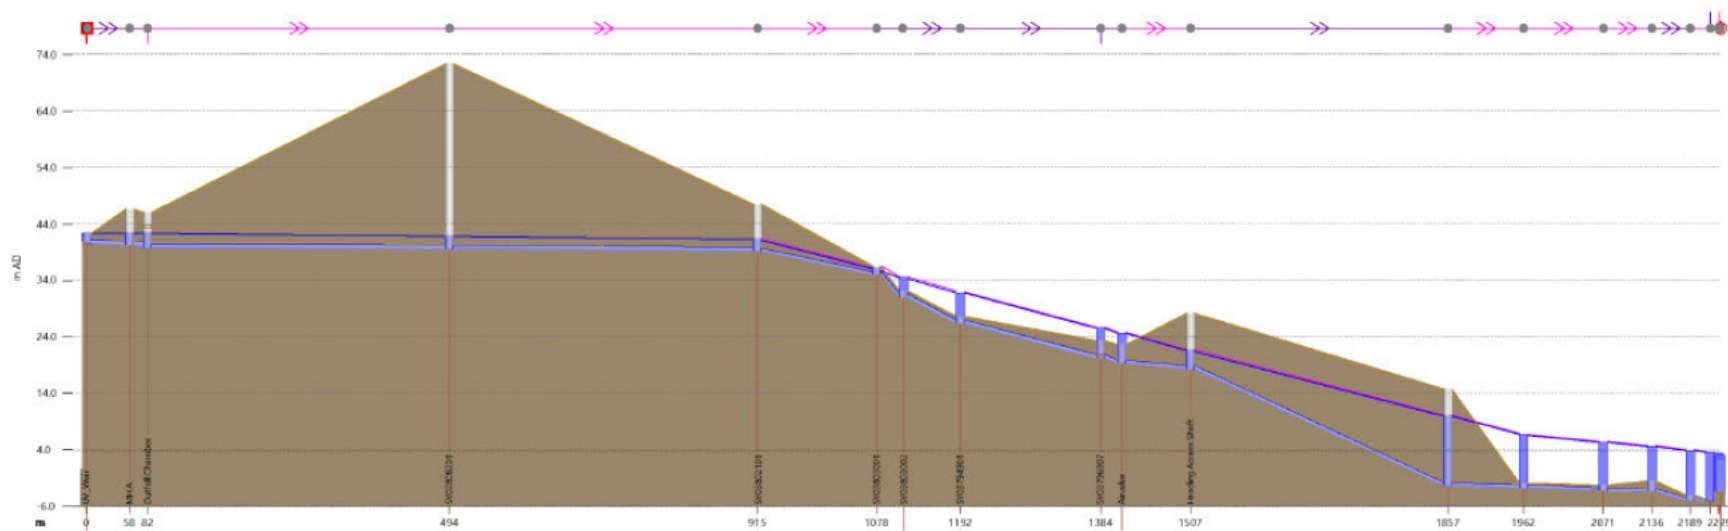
Existing Outfall Long Section showing flooding at STW at 650 l/s
